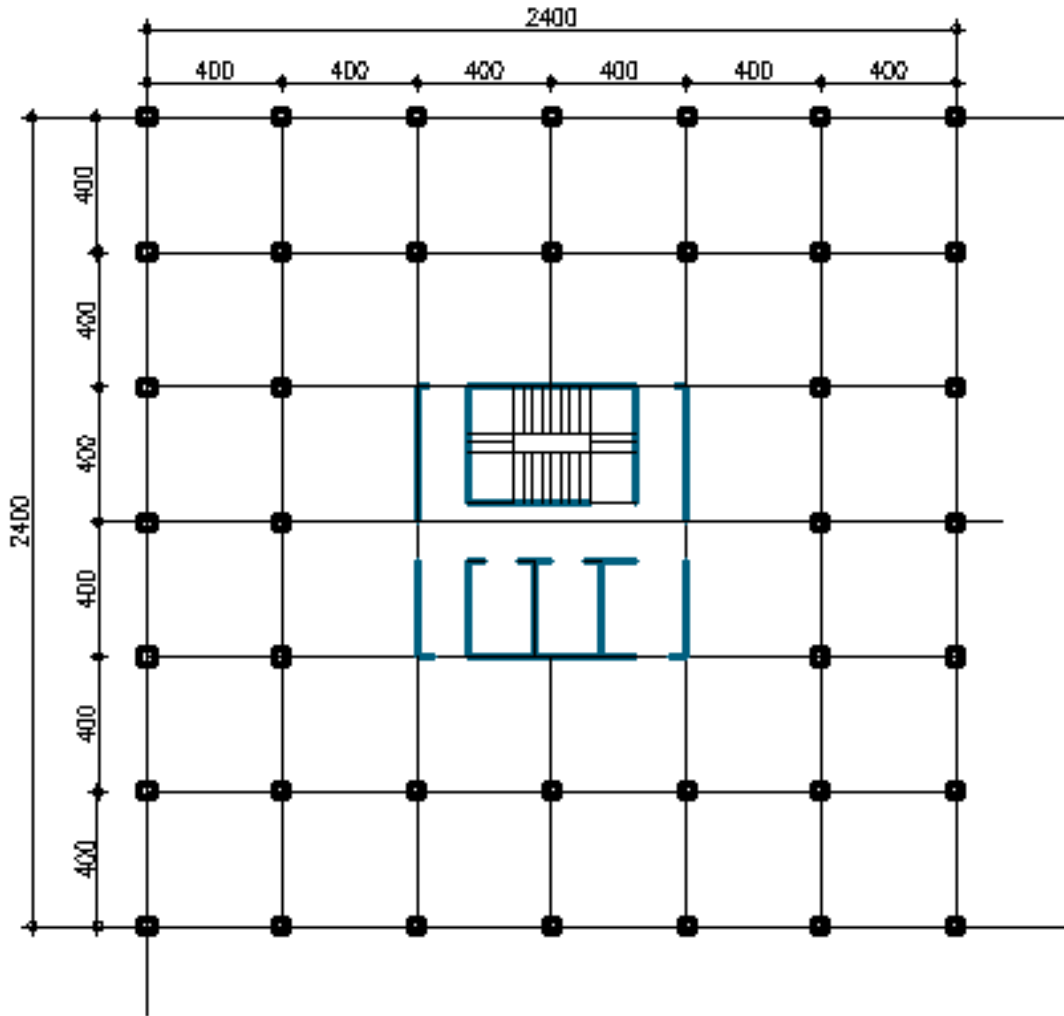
Building frame with section 24x24 m with columns axes every 4 m with concrete core wall in the centre with dimensions 8x8 m (source: the author)
